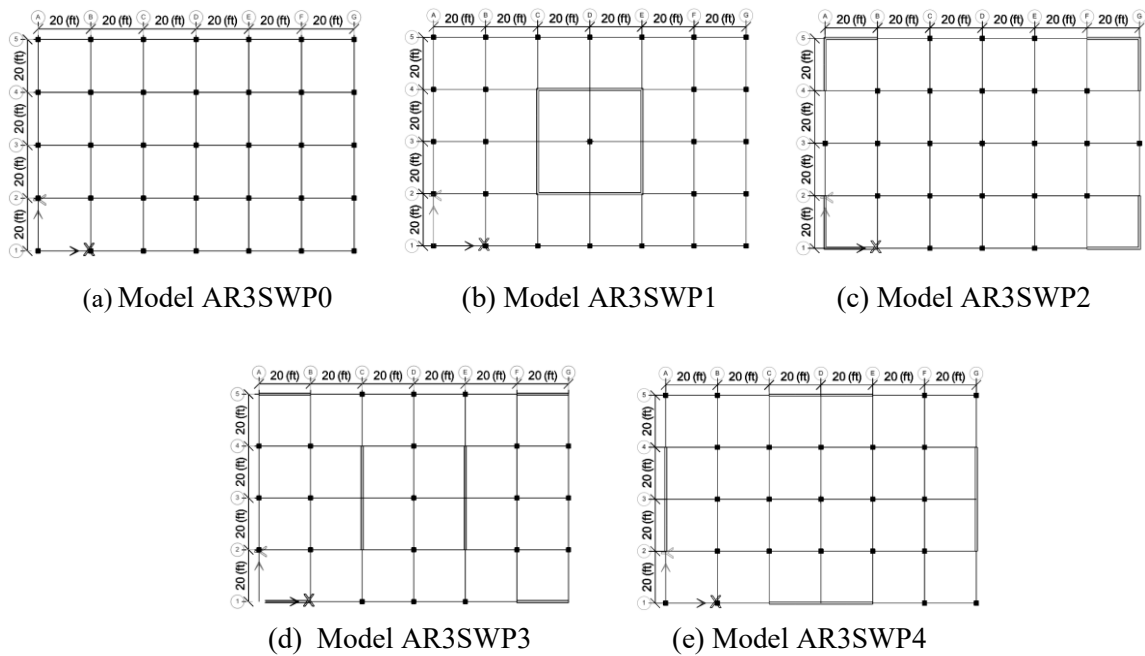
Shear-wall layout plans for aspect ratio 1:1.5
